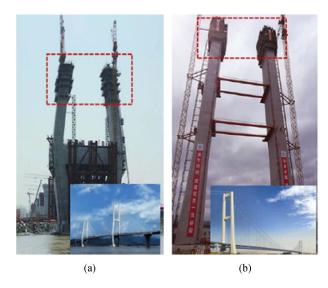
The use of hydraulic climbing formwork technology in concrete pylon of (a) Tongling Yangtze River Bridge and (b) Yangsigang Yangtze River Bridge.
